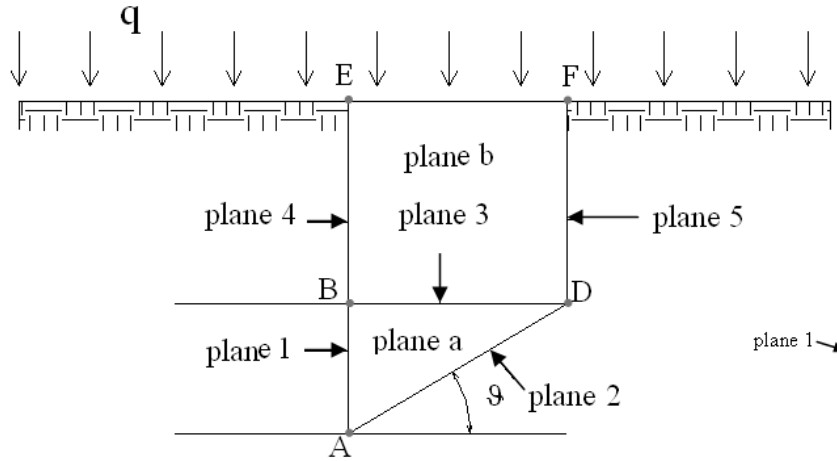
Longitudinal section of the zone close to the excavation face, with the scheme of the geometry adopted in the simplified analysis of the face stability.
